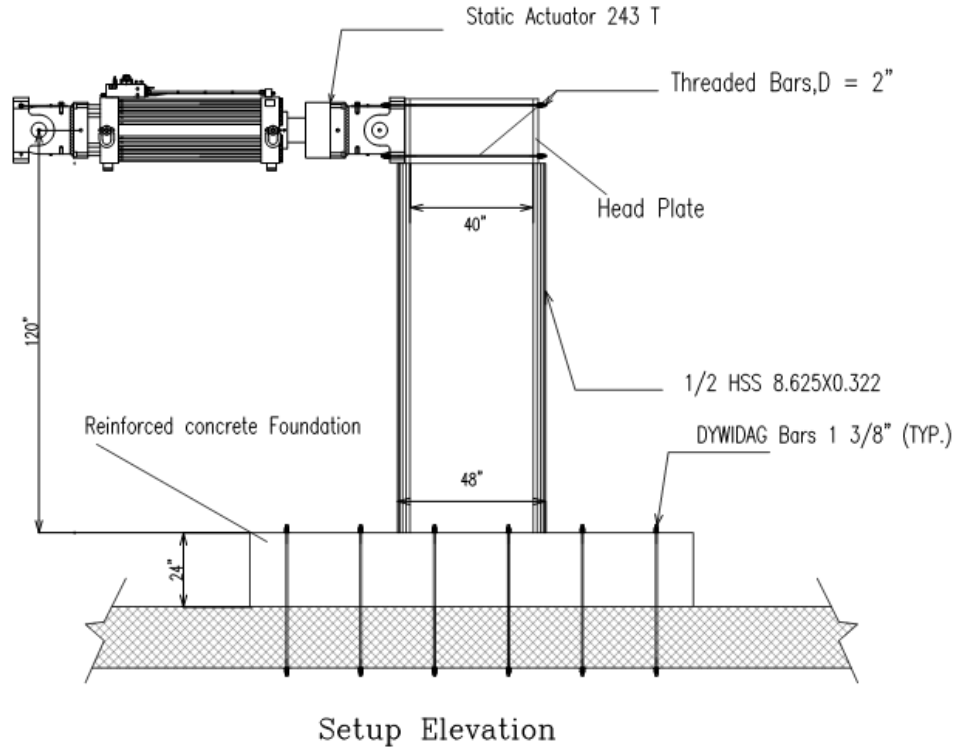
Elevation of Specimen CFSSP-NB1 Setup
